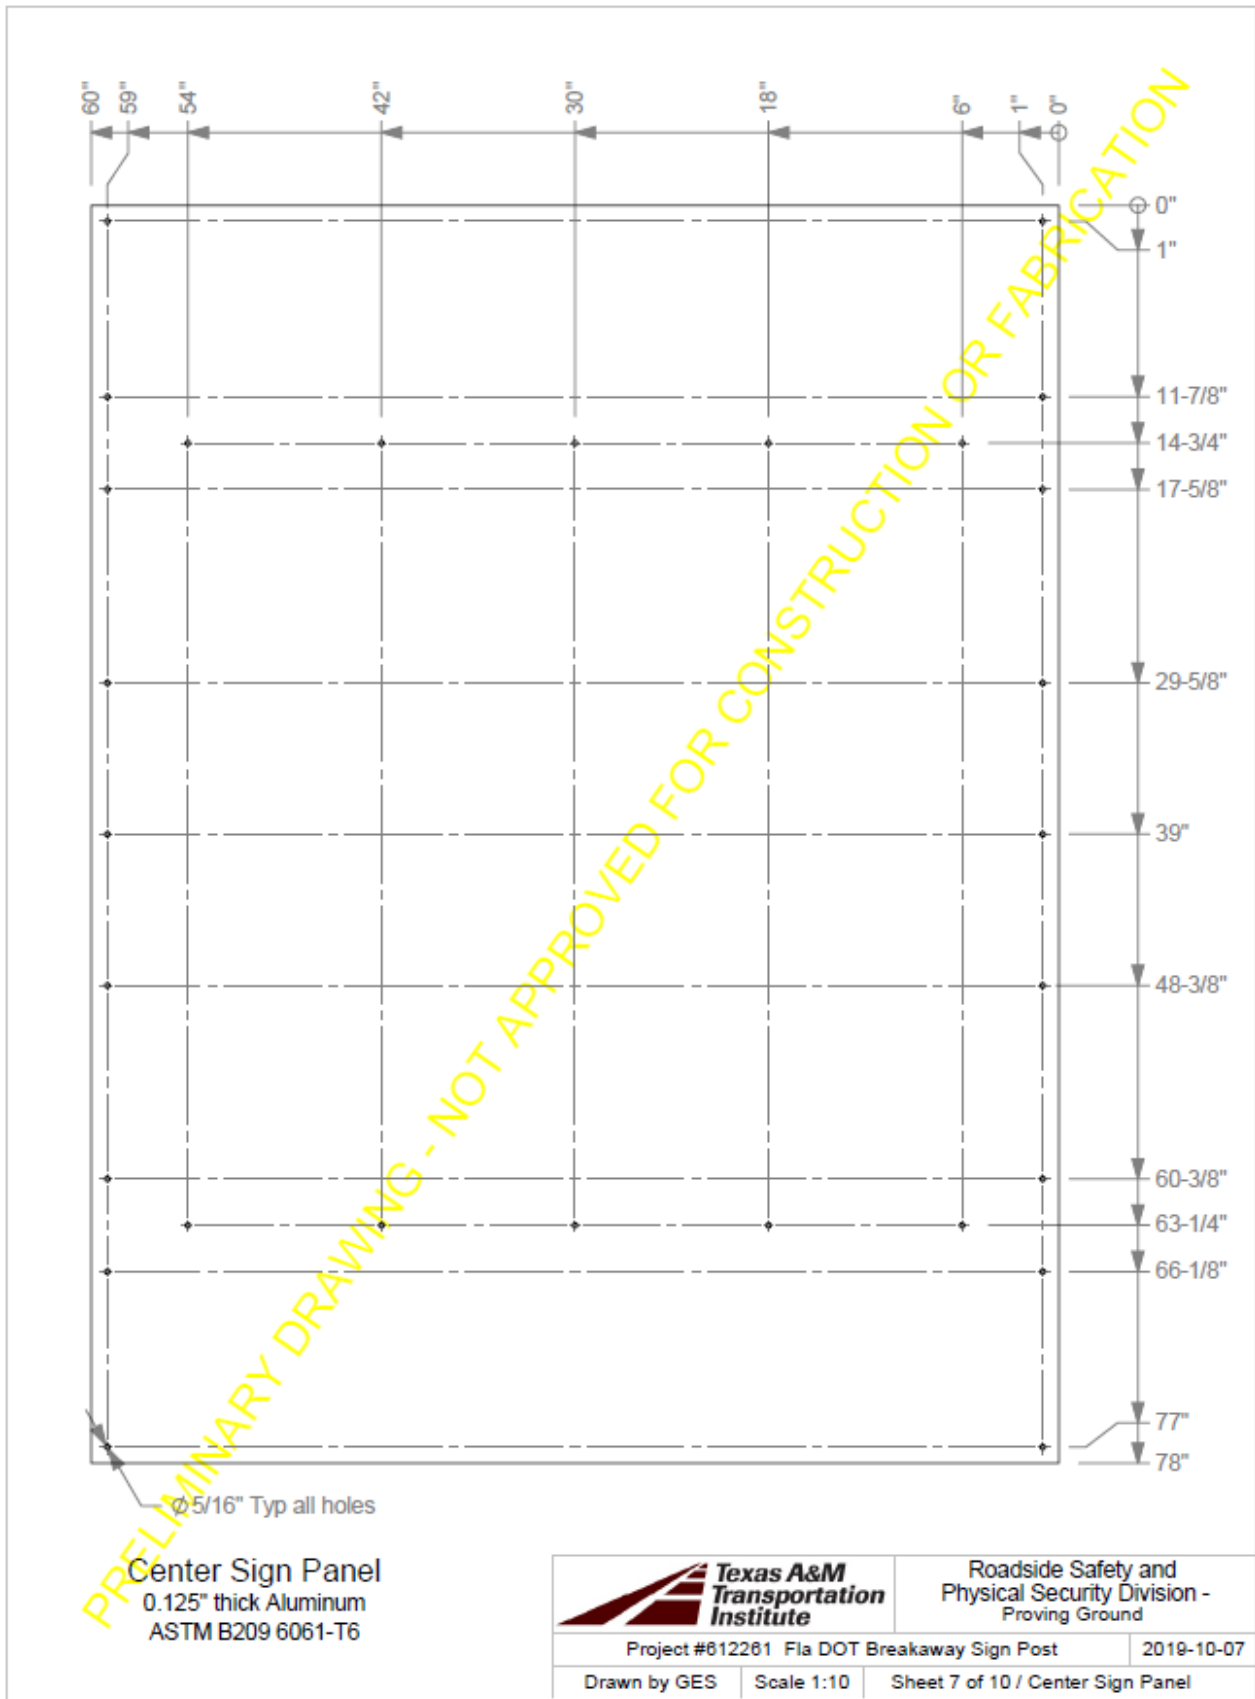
Preliminary Drawing (Sheet 7 of 10).
